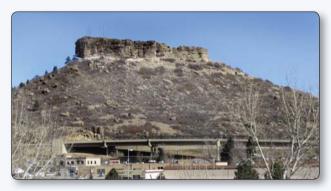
The roadway profile for this bridge needed to provide for clearance over a railroad track and made the bridge prominent in relation to the tops of buildings in the surrounding town. Skillful use of color blended this bridge into its surroundings. Perry Street Bridge, Castle Rock, Colorado.
